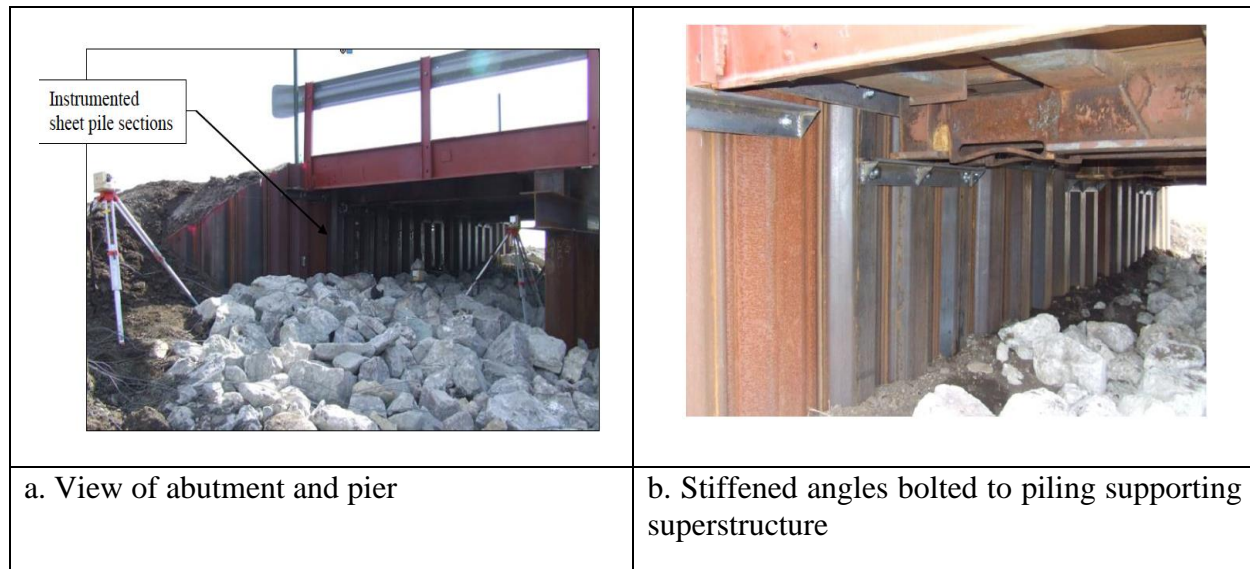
Overview of sheet pile bridge abutment in Winnebago County, Iowa (Evans et al., 2012)
